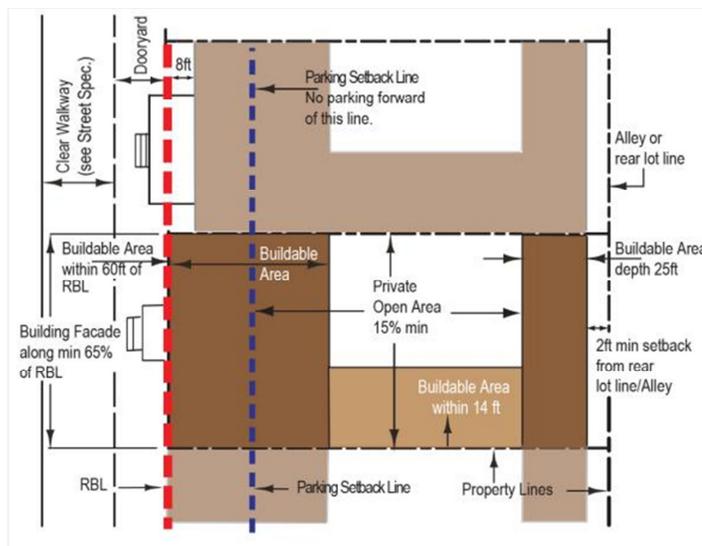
Townhouse/Small Apartment Siting Standards
